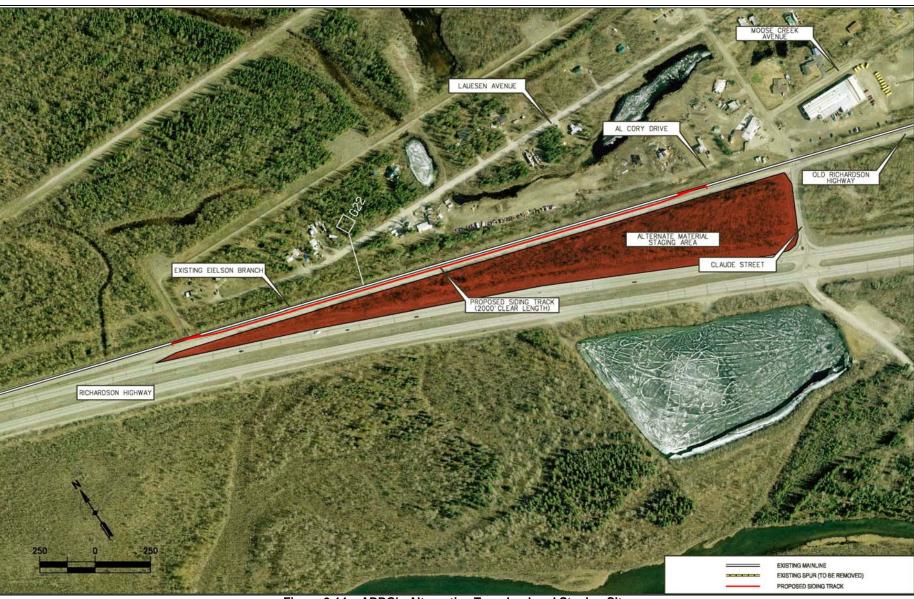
ARRC's Alternative Transload and Staging Site
